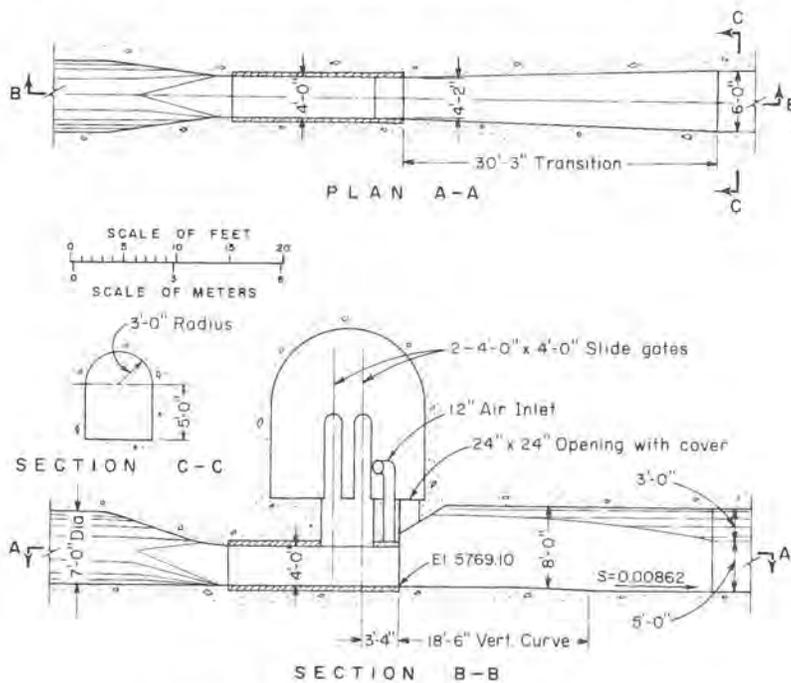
Navajo Dam Auxiliary Outlet Works
